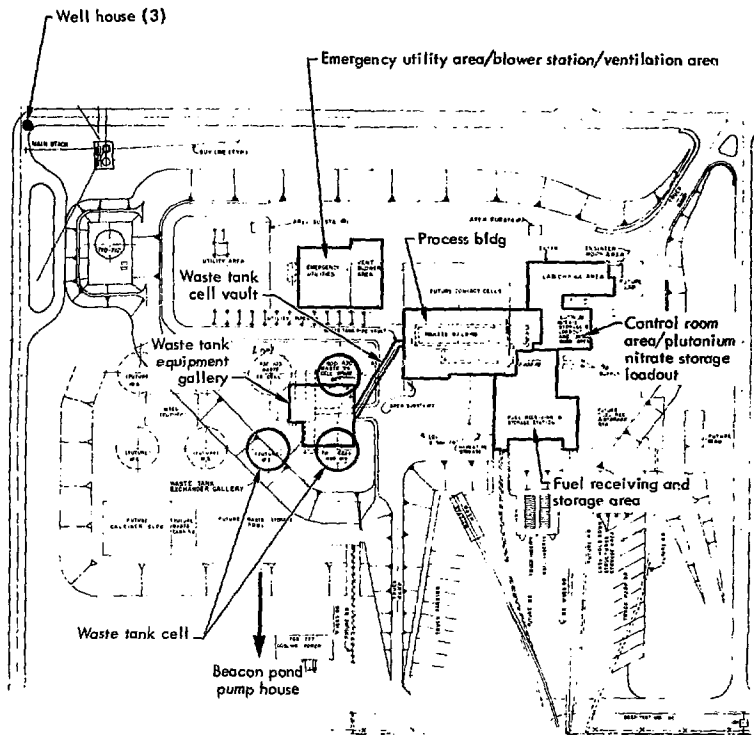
Plan view of Barnwell Reprocessing Plant.
